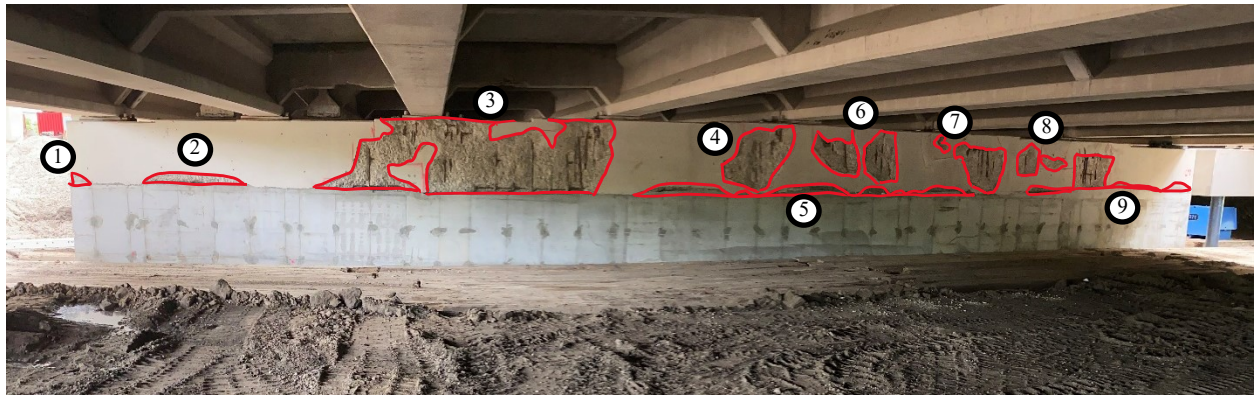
West face of Pier 12WB (photo taken in 2020)
